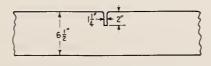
DETAIL AT BEGINNING AND ENDING OF PAVEMENT-LONGITUDINAL SECTION
